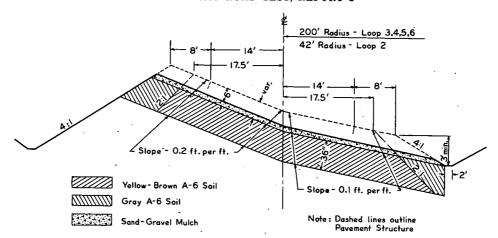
Typical cross-section of embankment on turnarounds with sand-gravel mulch cover.
